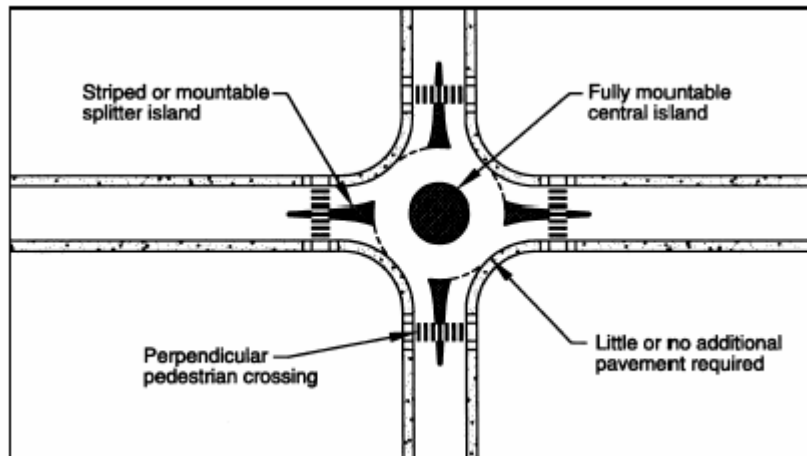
Typical Mini-roundabout ⁽¹⁴⁾
